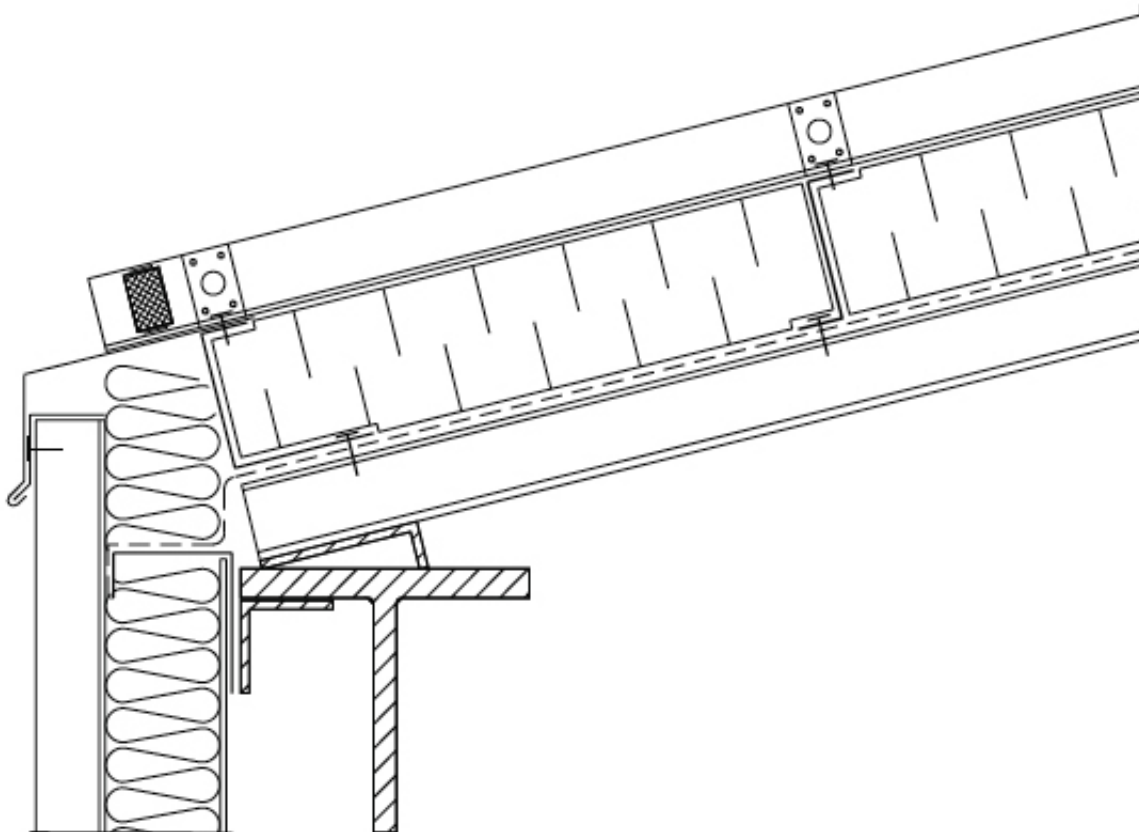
A: Eave - Standard EaveInstallation/Assembly Notes:
